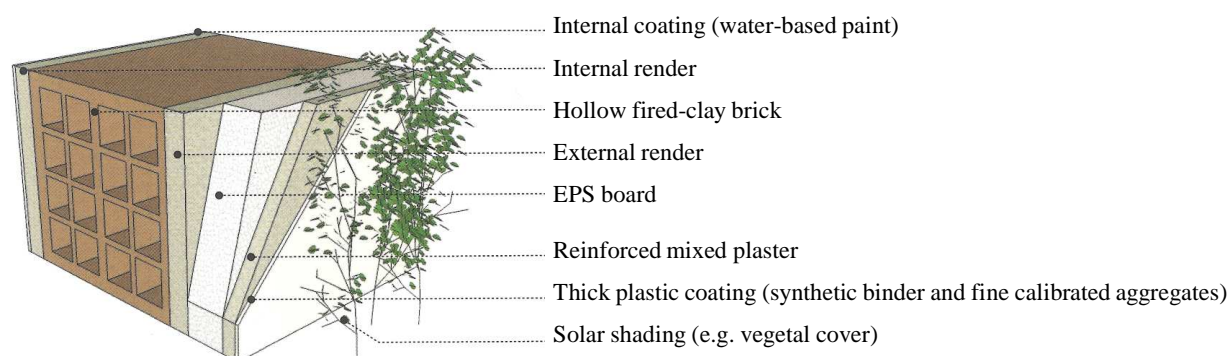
Detail of an external wall with ETICS (Tirone & Nunes, 2007)
